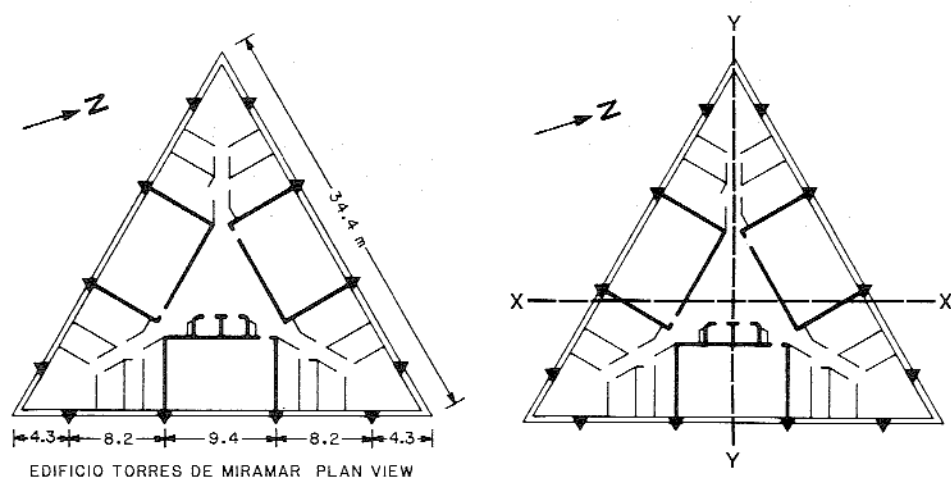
Plan-view of the building showing dimensions and locations of shear walls and columns as well as the main axes used for free vibration testing.
